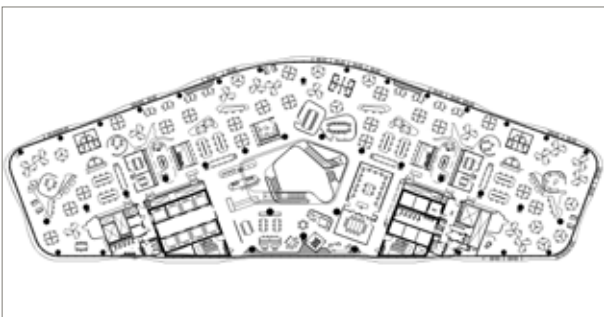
Typical Floor Plan – Case Study 3 (2014).
